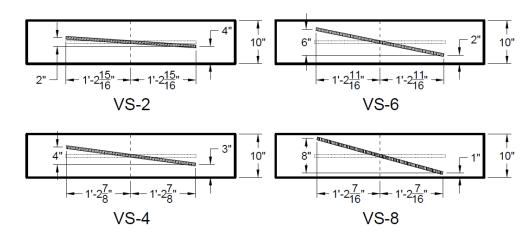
Section Views of the Vertical Skew Misalignment Specimens
